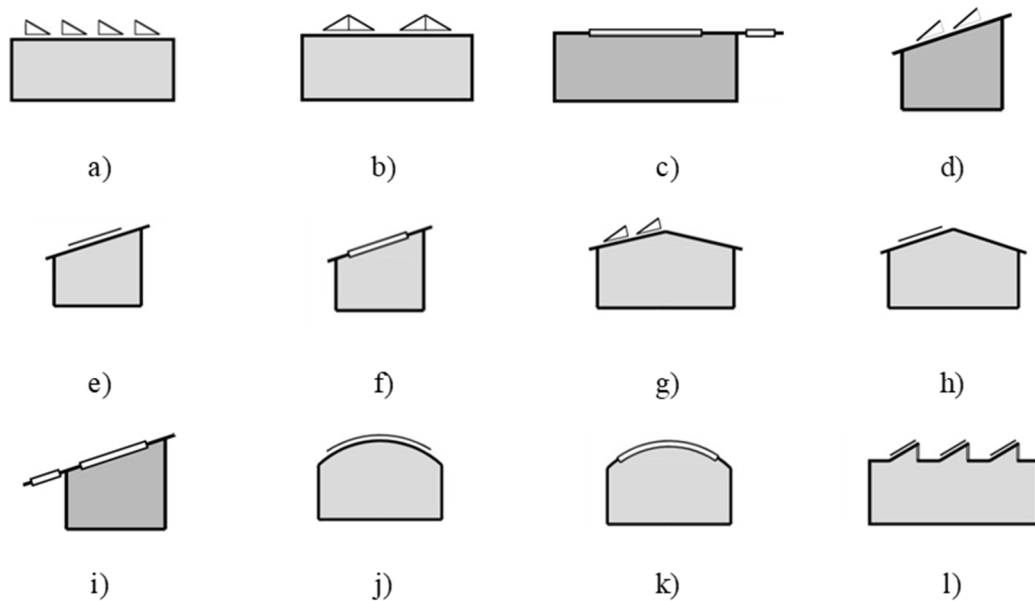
Main types of architectural integration of PV modules into roofs of public buildings: a, b, c) flat roofs; d, e, f) mono-pitched roof; g, h, i) double-pitched roof; j, k) barrel vaulted roof; l) north light roof
